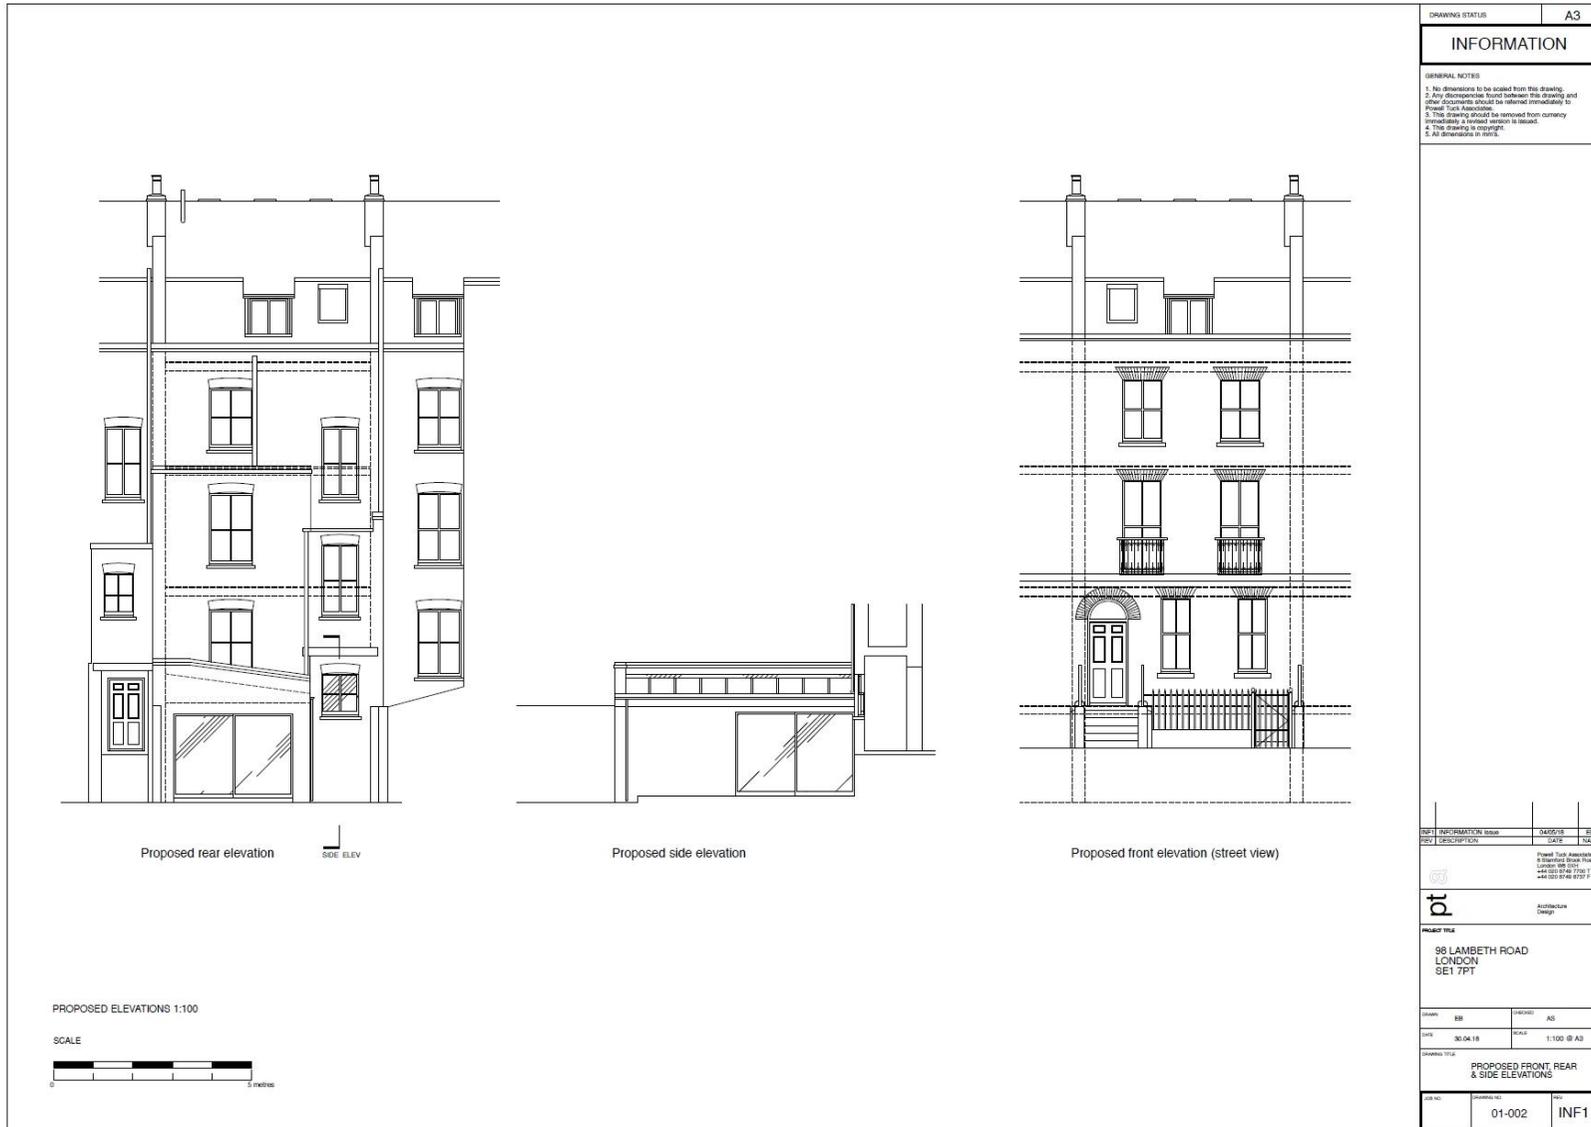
Front and Rear Elevations of No. 98 Lambeth Road showing proposed alterations
